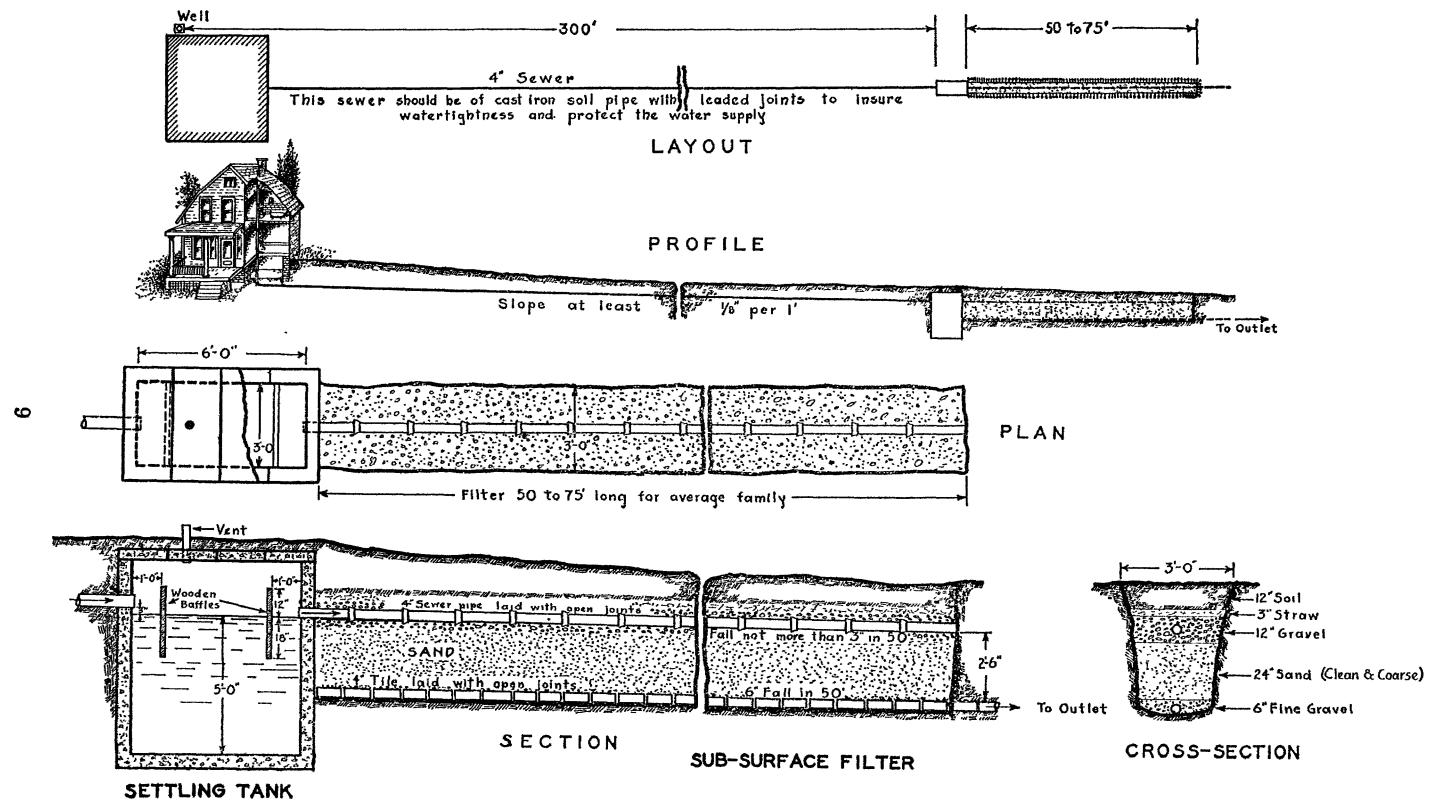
SETTLING TANK AND SUBSURFACE FILTER FOR DWELLING.
